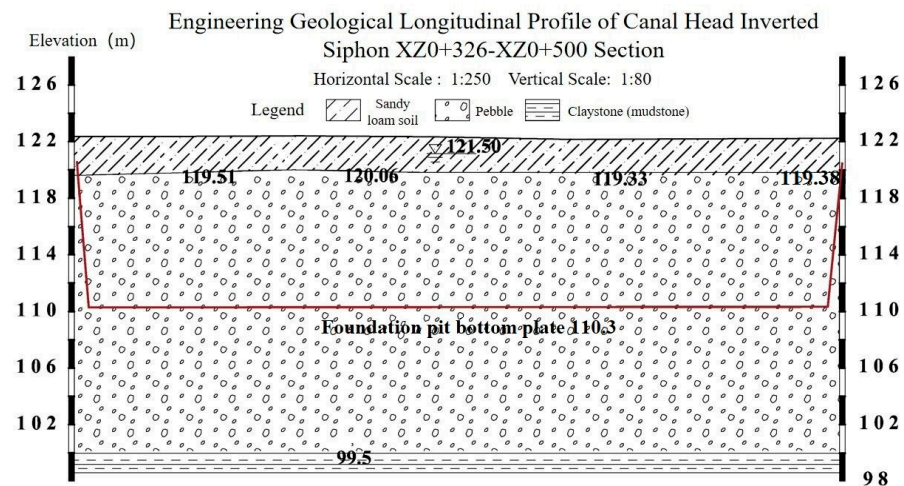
Engineering geological longitudinal section and foundation pit location of canal head inverted siphon section XZ0+326–XZ0+500.
